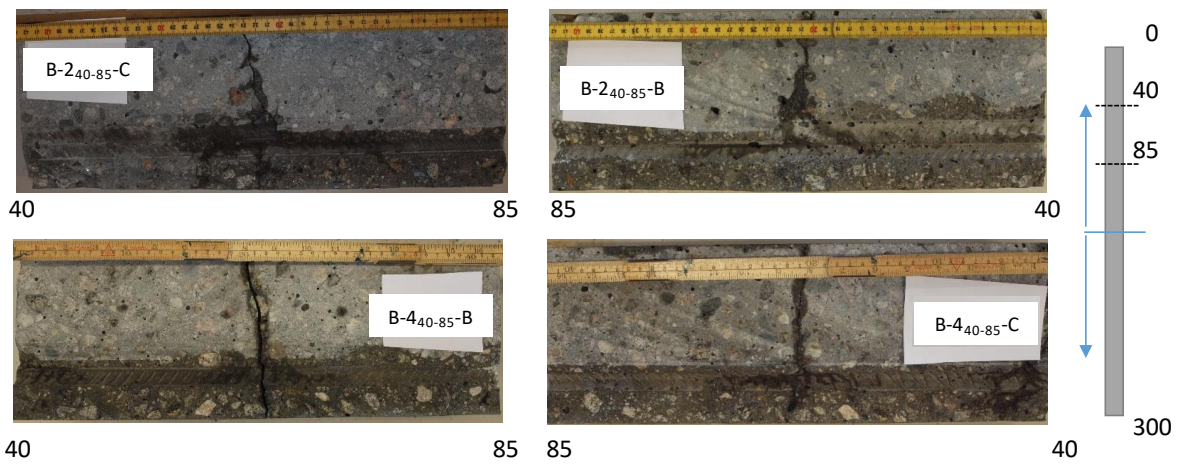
Steel-concrete interface of beam B section 40 to 85 cm
